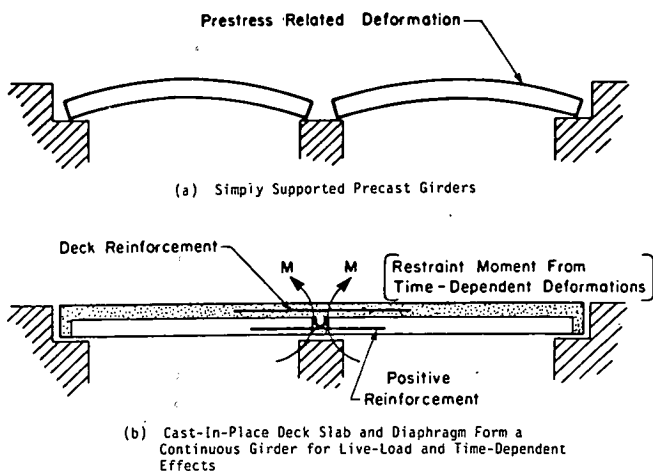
Two-span bridge with precast, prestressed girders made continuous.
